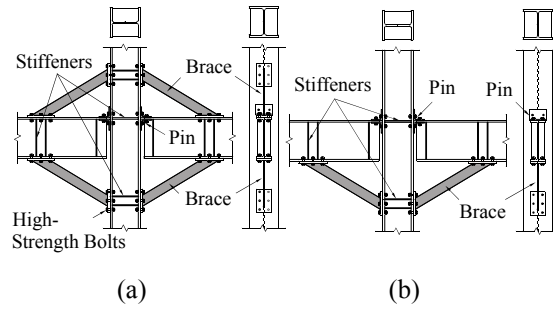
Weld-free connection details: (a) double-side bracing; (b) single-side bracing
